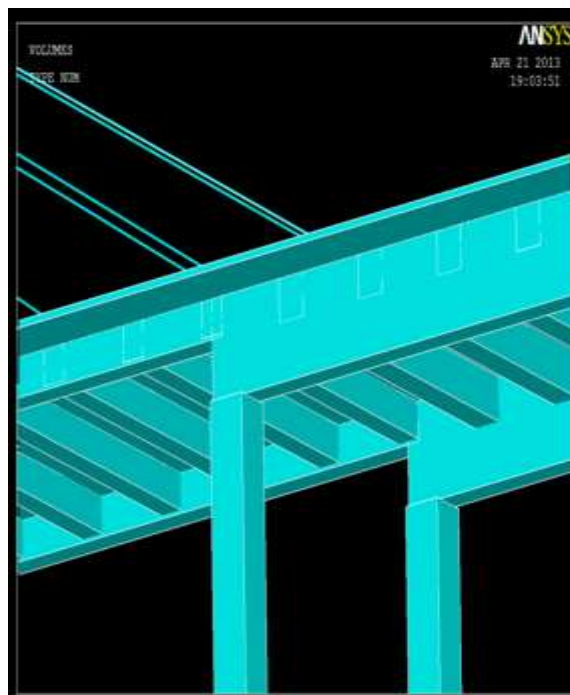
Cable Stayed Cross-Girder Side Beam and Approach Side Beam
